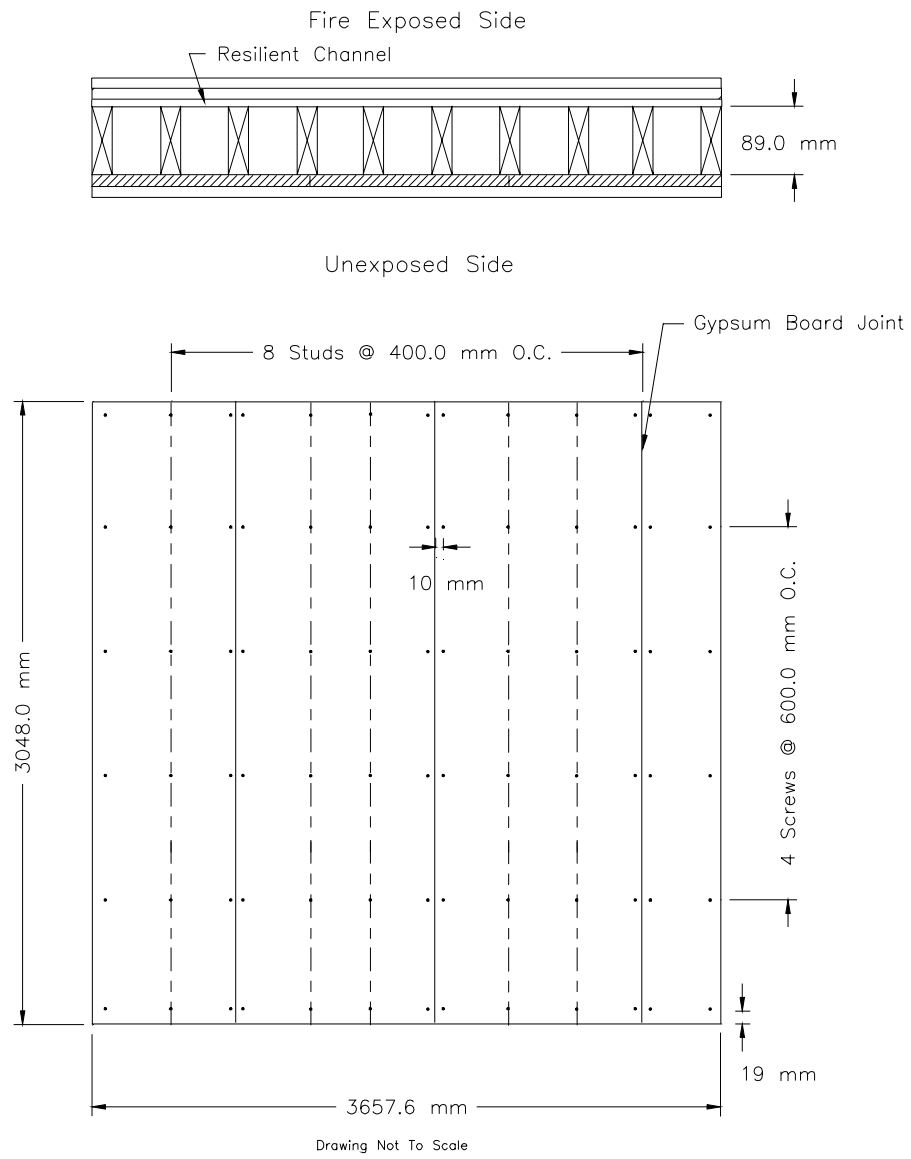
Screw Locations For Wood Stud, 1x2 Gypsum Board Layers, Full-Scale Assembly, Resilient Channel on Exposed Side (Base Layer Unexposed Side)
